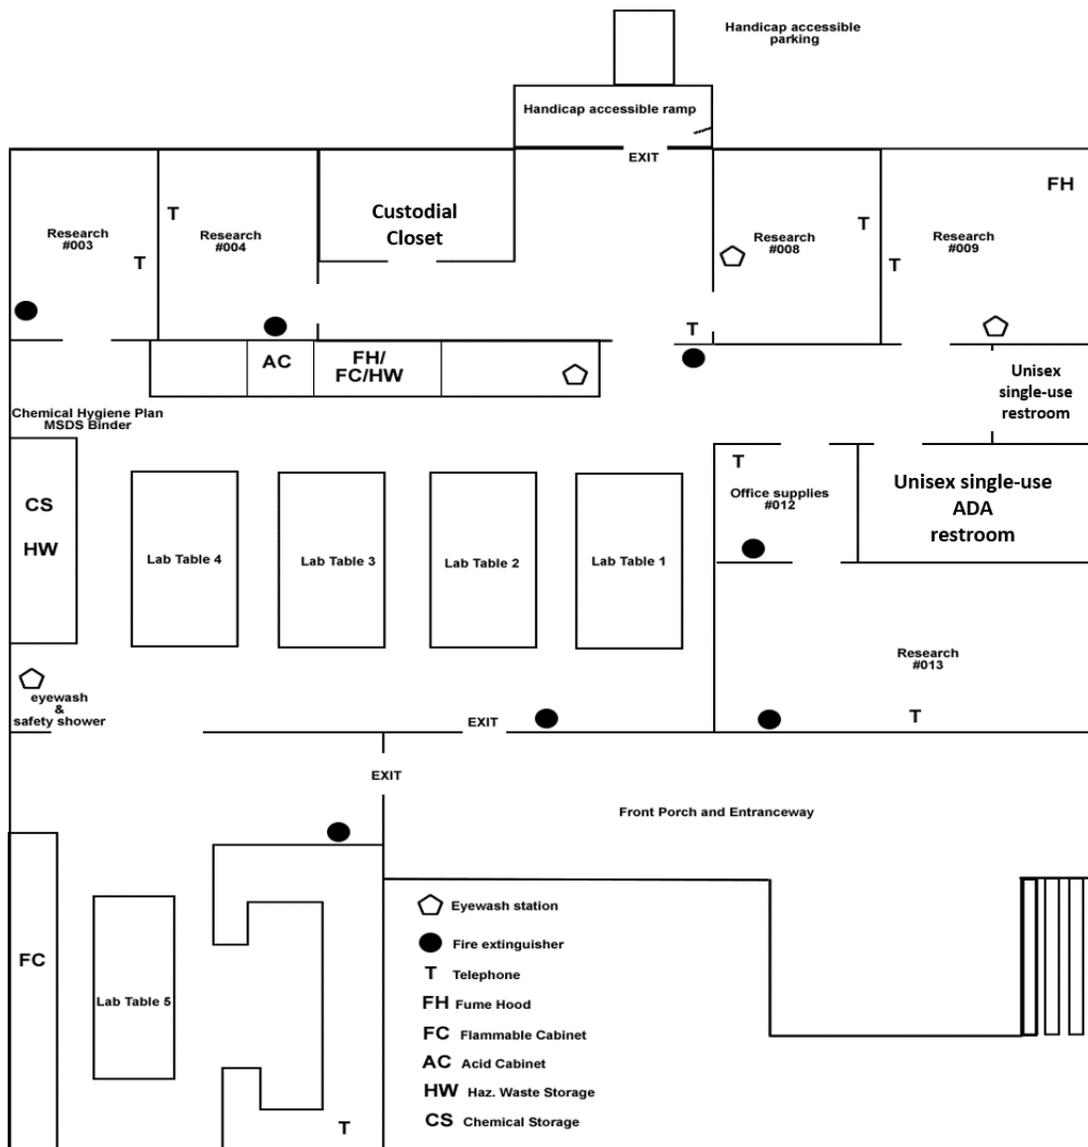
Building 501, Log Cabin teaching and research laboratory floor plan
